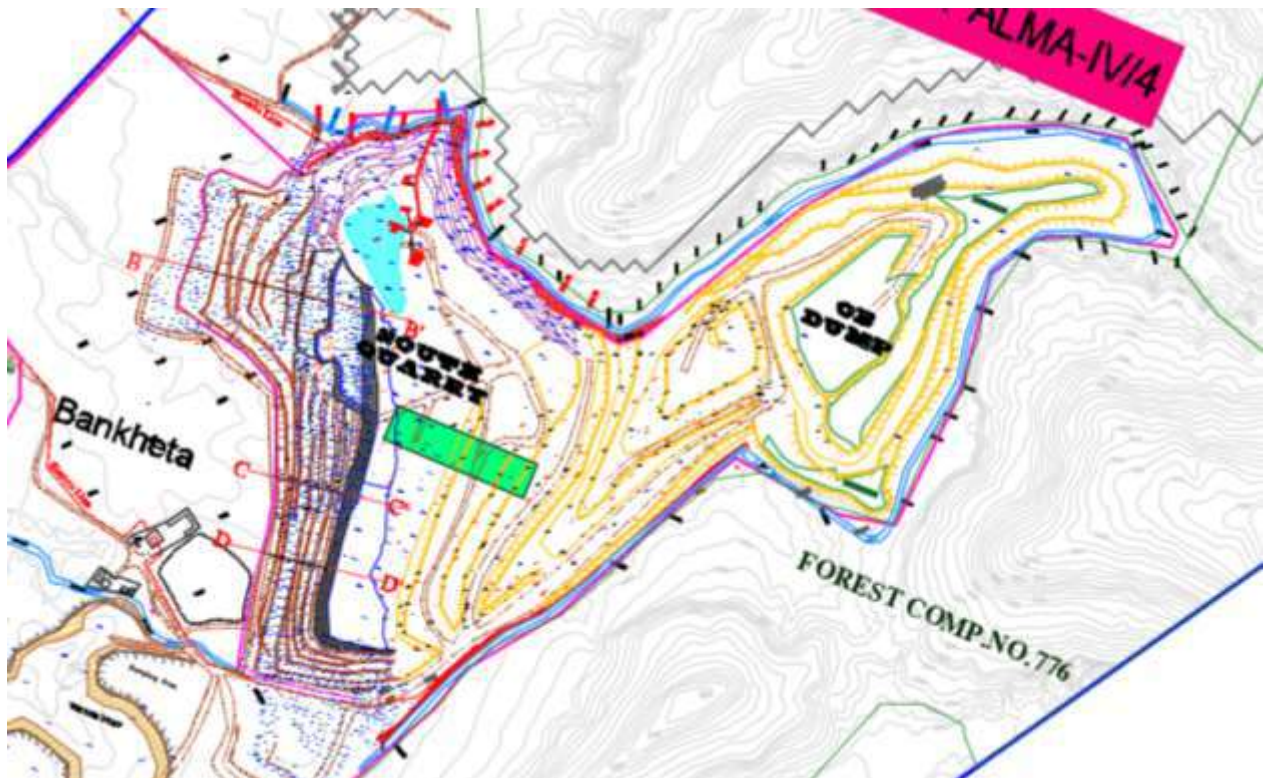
Positions of section B-B', C-C' & D-D' in existing pit of south quarry of Gare Palma IV/4
